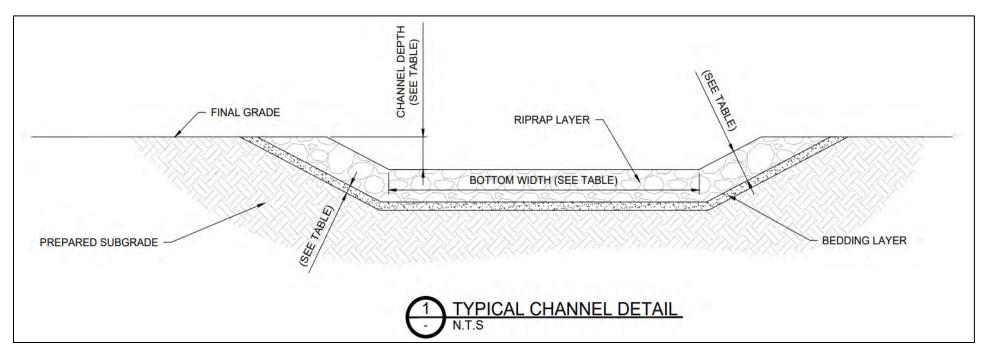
Typical Trapezoidal Channel with riprap lining. The figure shows callouts for bottom width and channel depths. Sideslopes on the channel can vary along with the amount of bedding and layers required, based on the lining system and subsurface conditions. A trapezoidal shape can be applied to both subcritical and supercritical channels with linings and subgrade layers varying per designed channel section.
